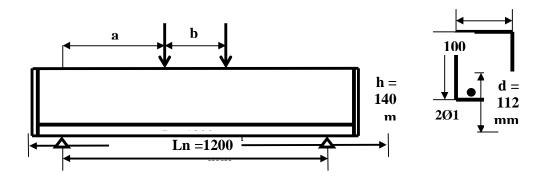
Details of Typical tested Beam Designed to Fail in Shear
